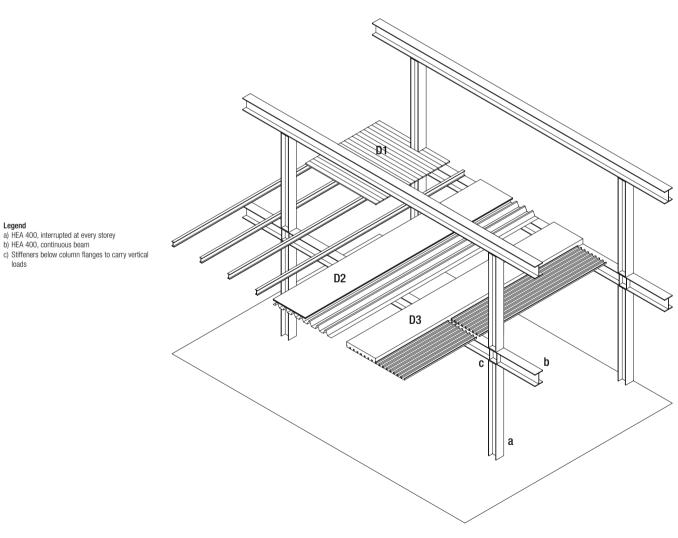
Frame with continuous beams nown here with floor constructions above level of primary structure
